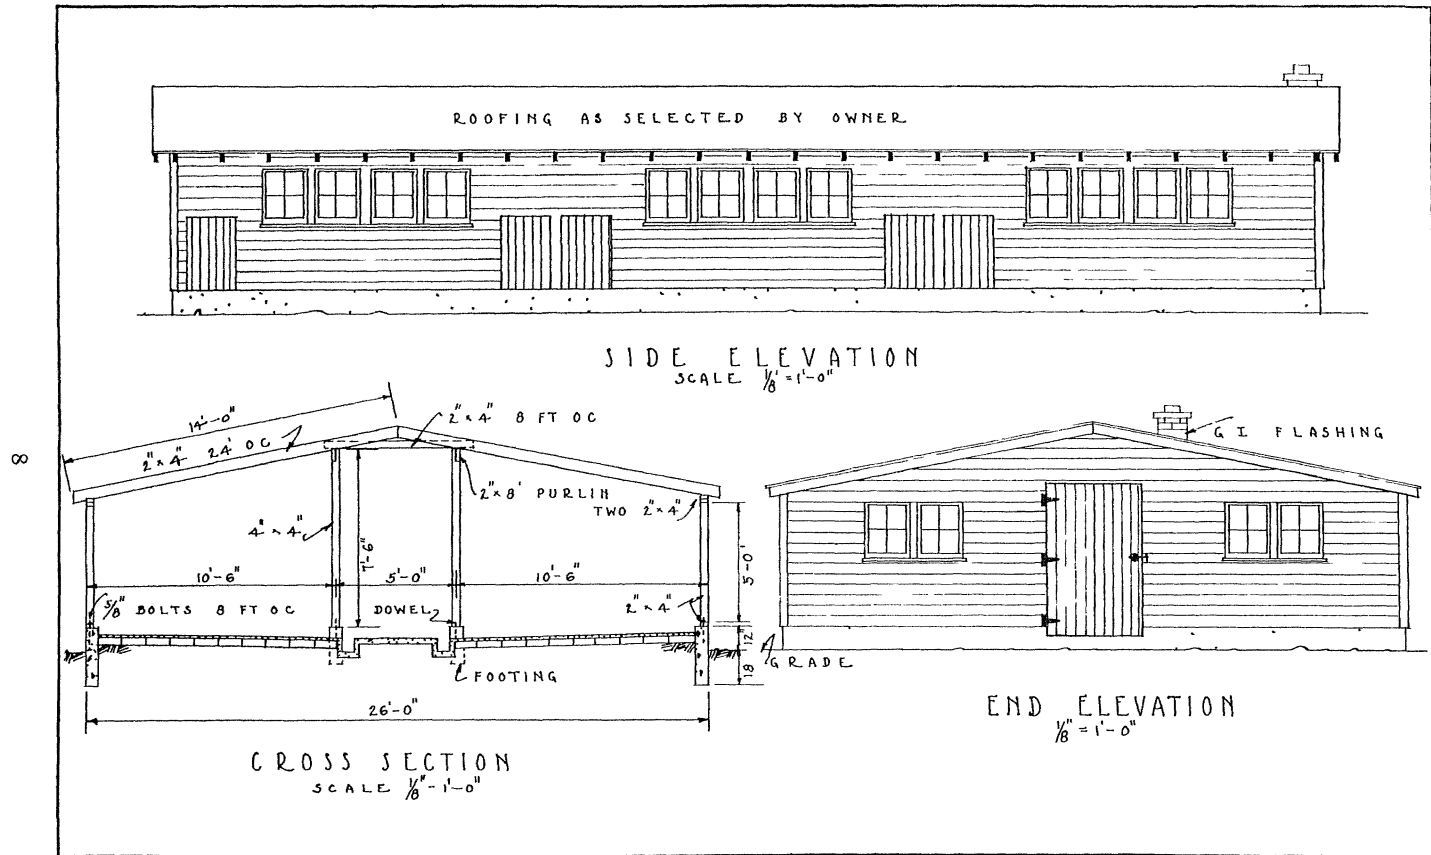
A gable roof house to run north and south similar to Fig 1 but having larger pens and wider feed alley. To make a complete set of drawings add Figs. 5, 12, and 13.
